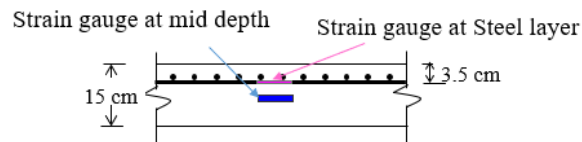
Position of strain gauge for slab on grade at construction site 1
